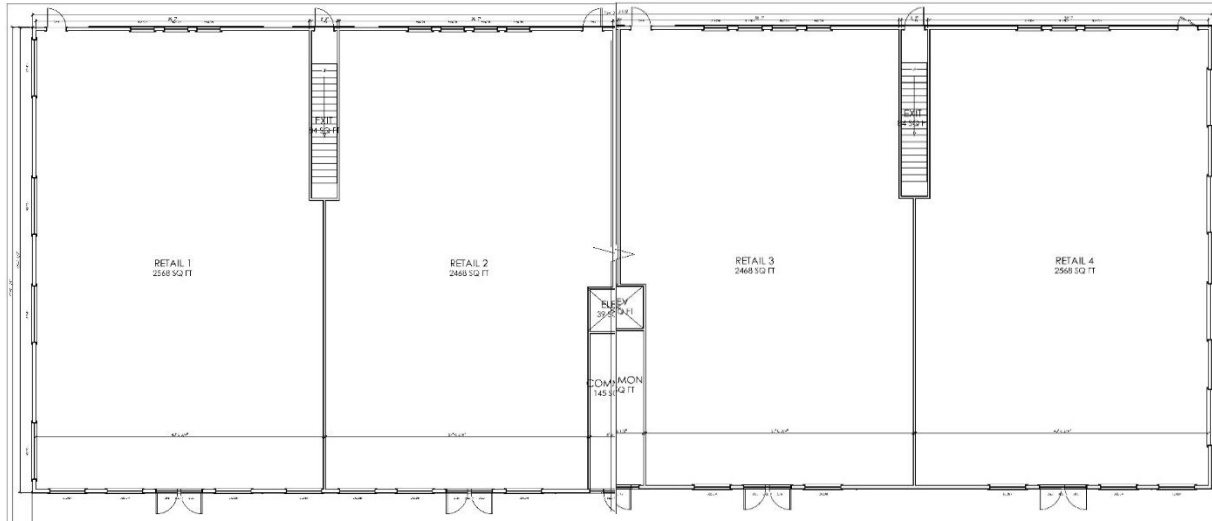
Floor Plans – Ground Floor Retail Units (Source: Wren Design Studio)
